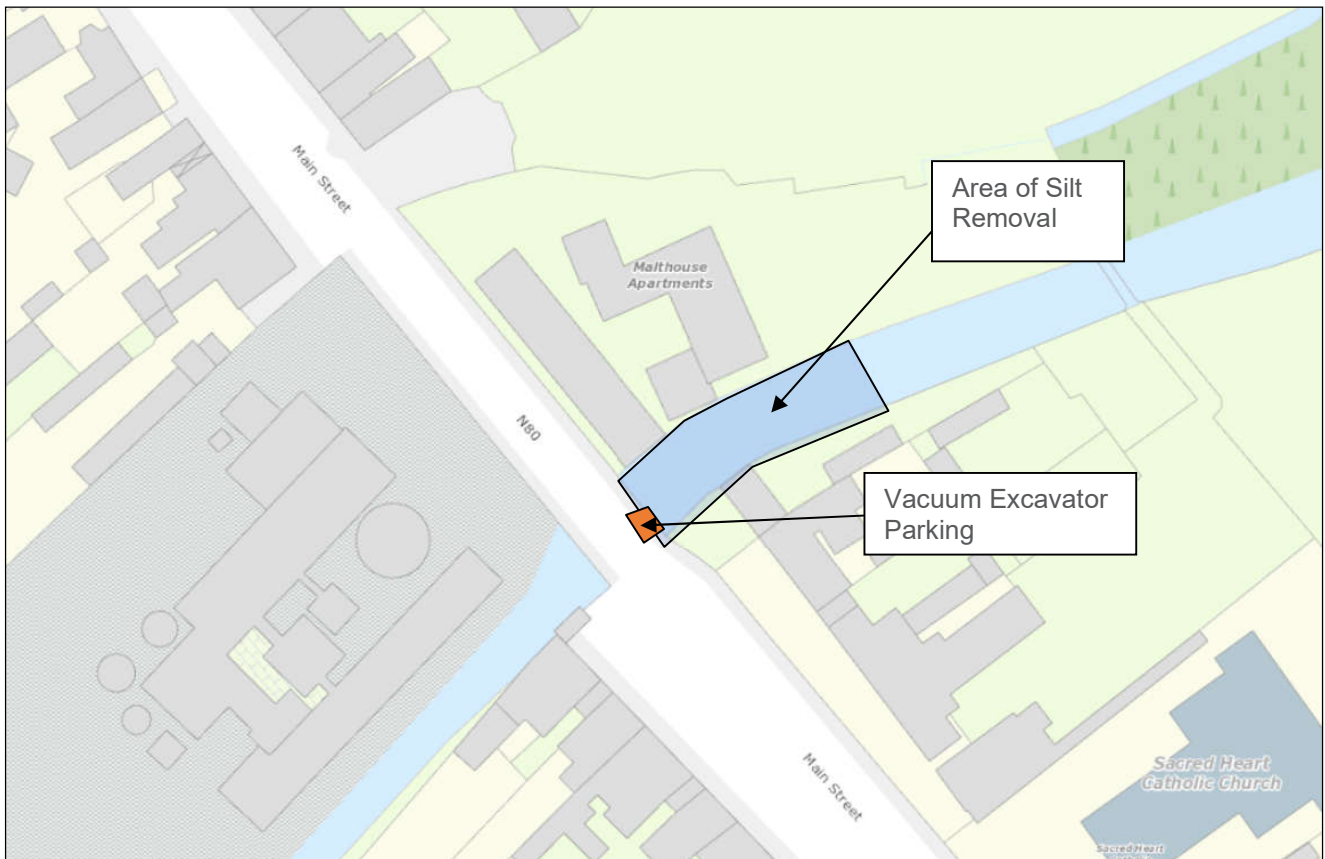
Location of proposed works at the N80 River Bridge in Stradbally, Co. Laois.
